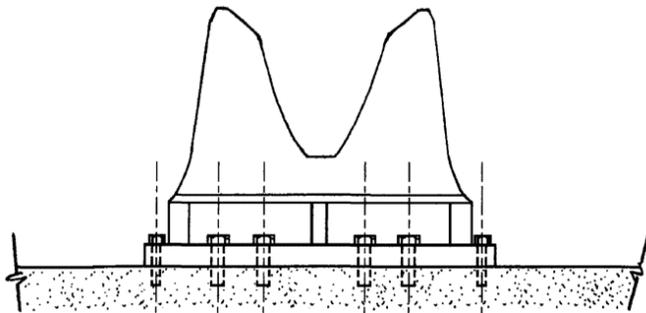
Centering pocket for a vertical-lift bridge
